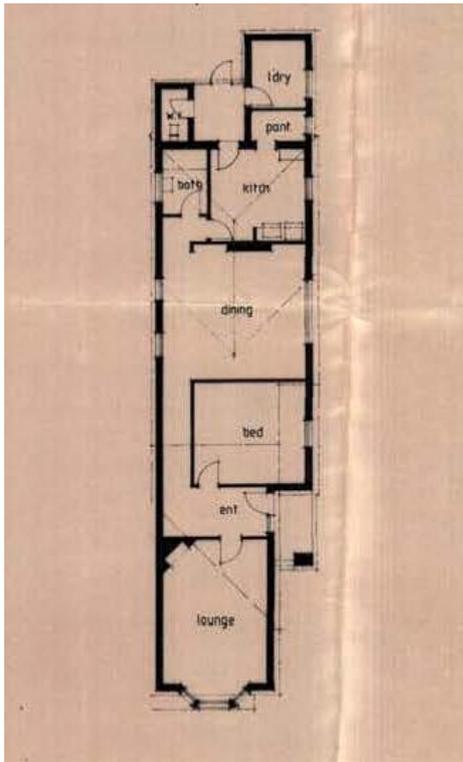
Existing conditions plan of 37 Rowland Street from 1991. This is assumed to be little changed from the original plan. (Source: City of Boroondara)
